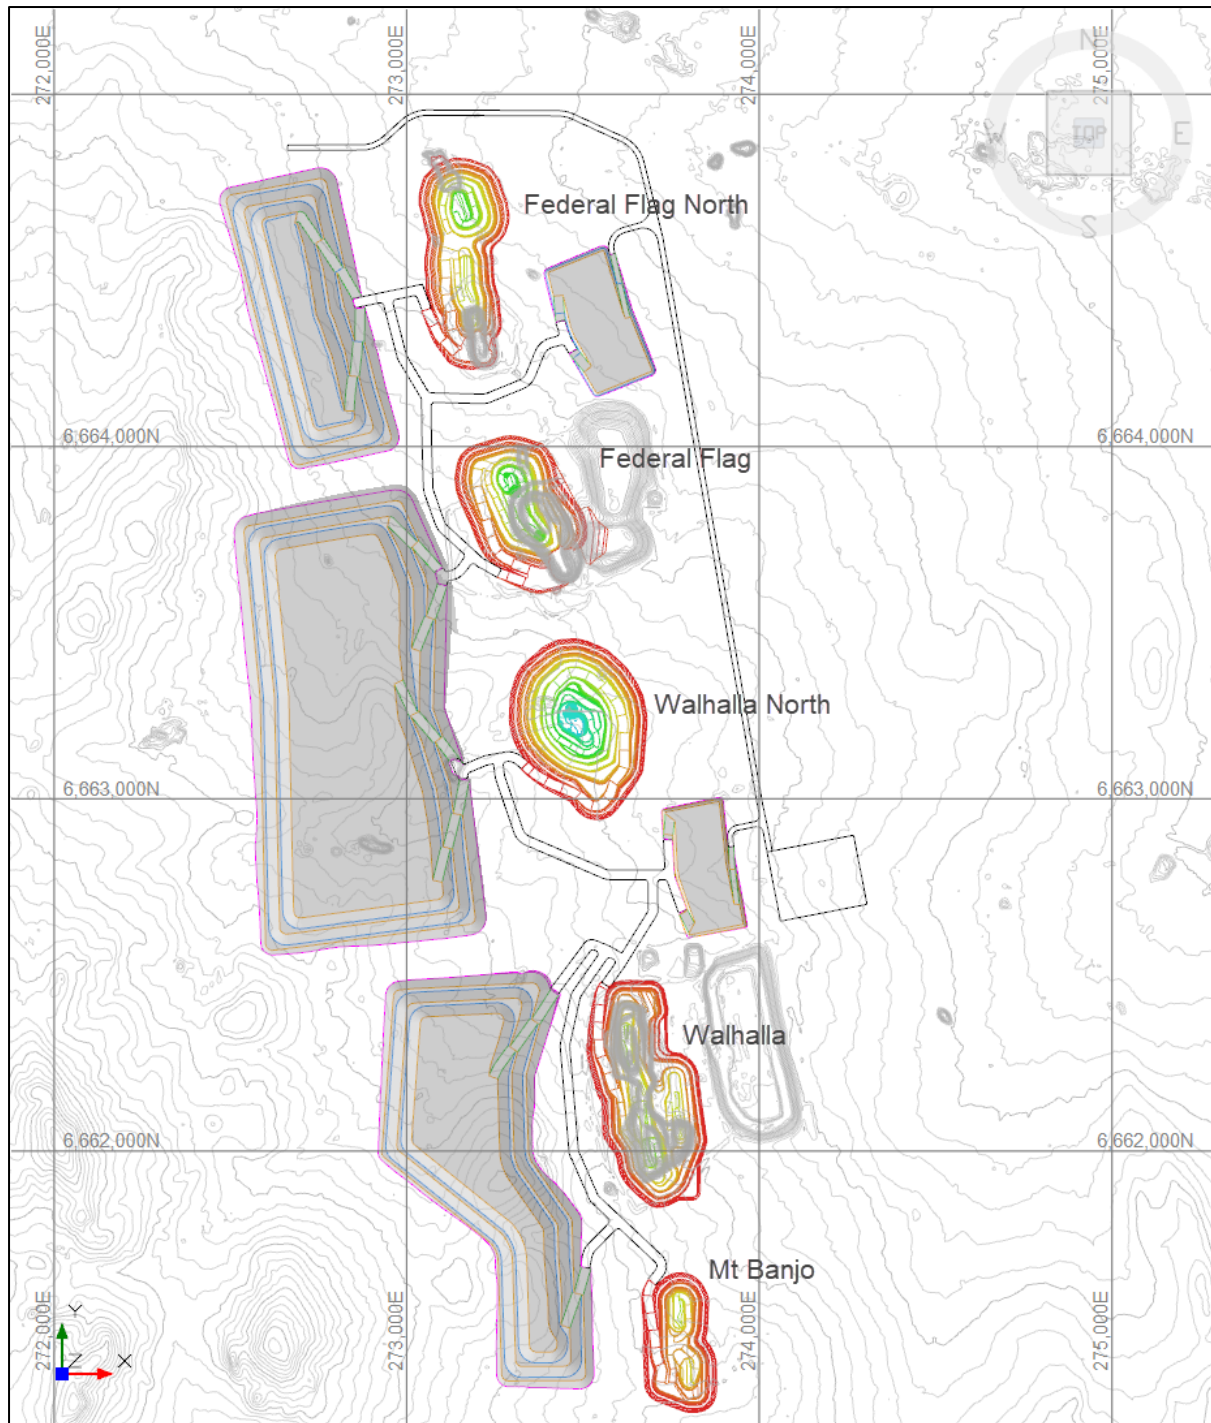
Round Dam open pit designs showing WRL, MOP and road layout
